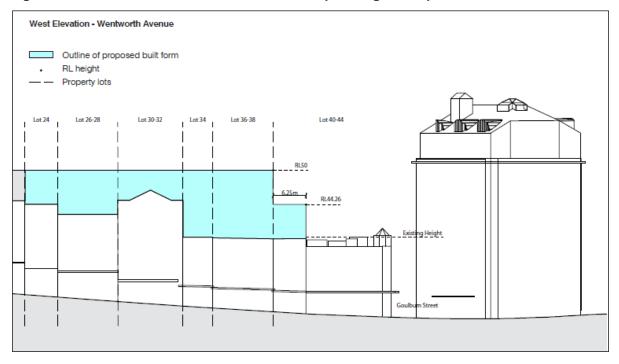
xxx: 24-44 Wentworth Avenue – Maximum street wall heights
